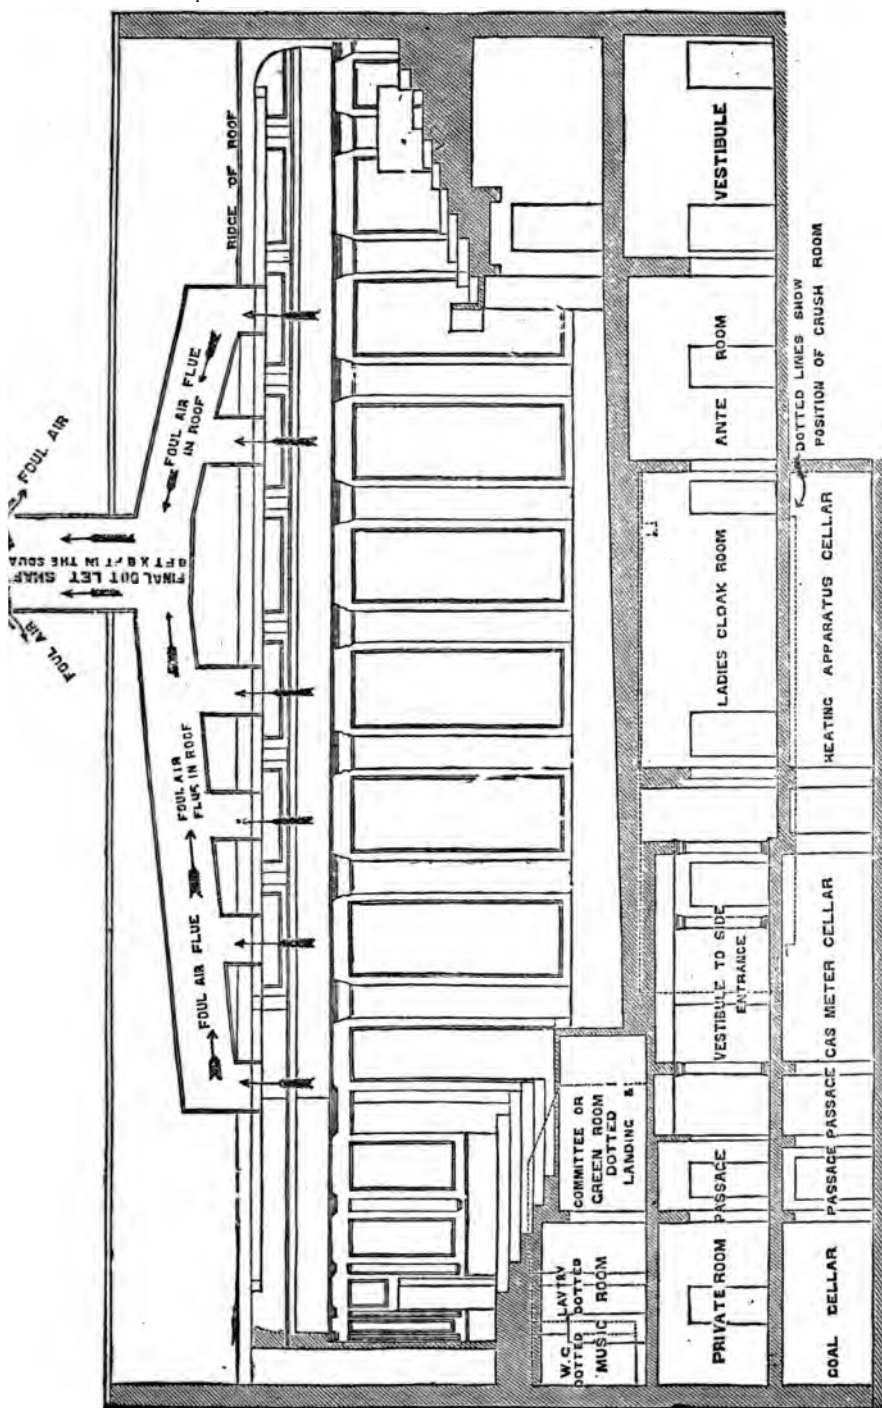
SECTION OF CONCERT HALL, MANCHESTER.
